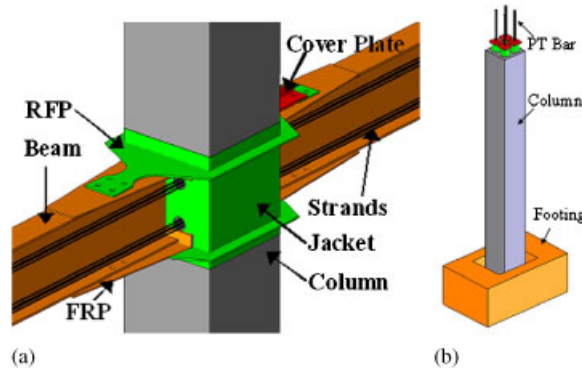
Proposed PT column and connection: (a) PT connection and (b) PT column (no energy-dissipating device).
